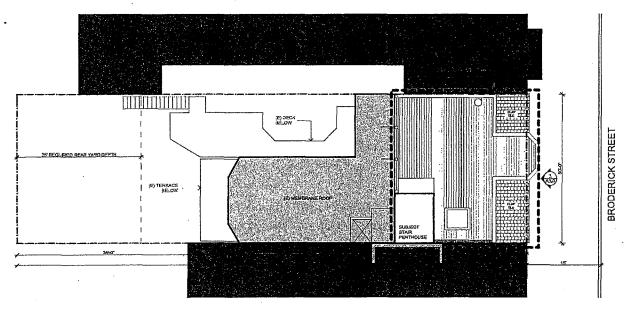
Roof Plan showing scope of work under "Permit 2" (from DNM Architect)
